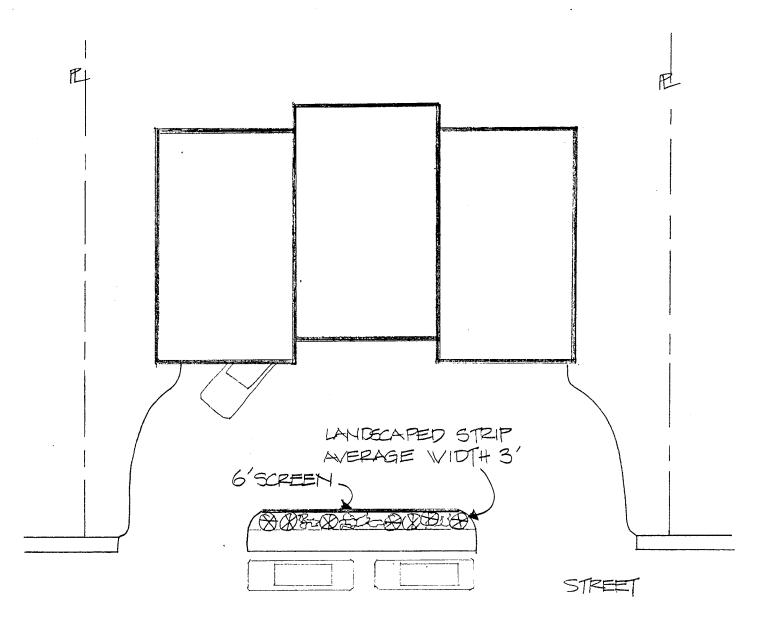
LOWRISE 3, LOCATION OF PARKING
